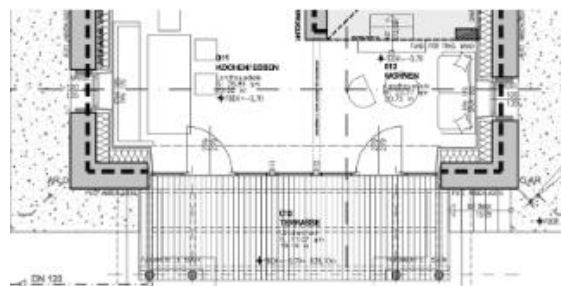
Floor plan of the south side of the ground floor, with internal insulation.
